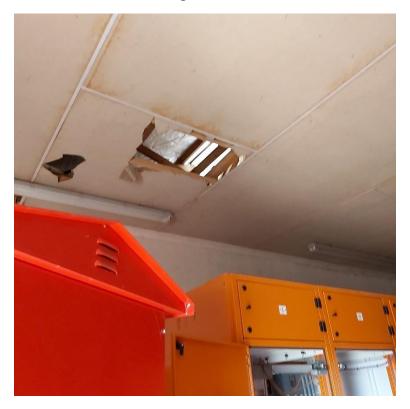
Open Section on the Ceiling and Roof of the MCC Building
